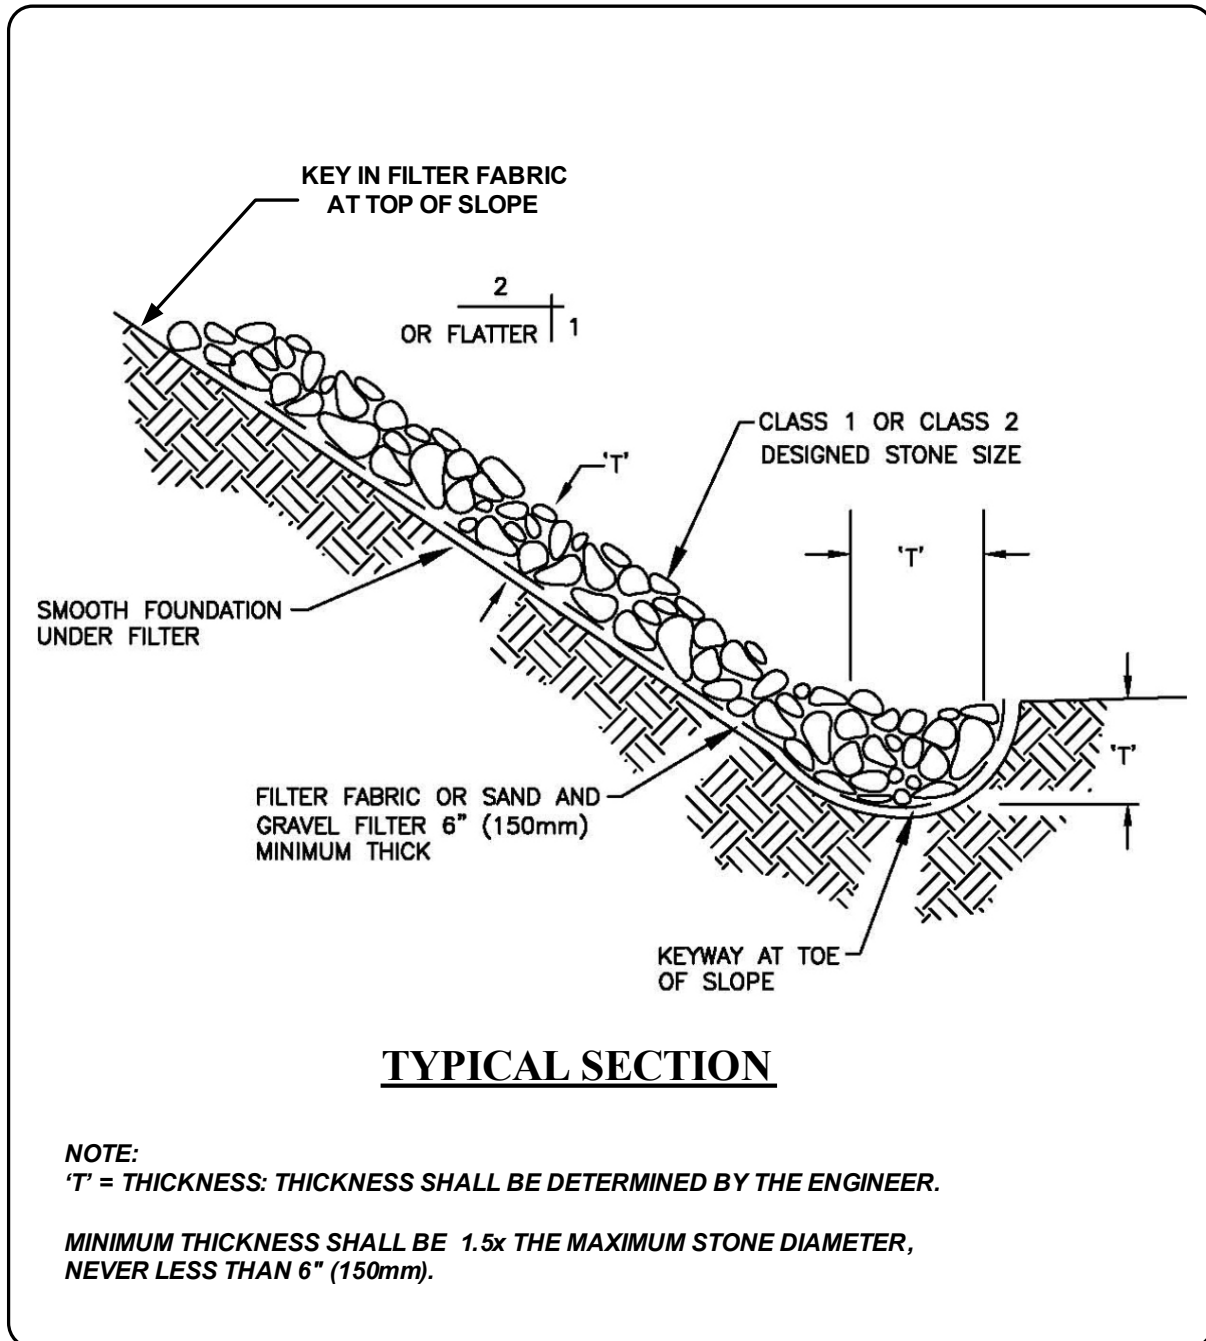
12. Soil Erosion Protection – Rip Rap Protection
